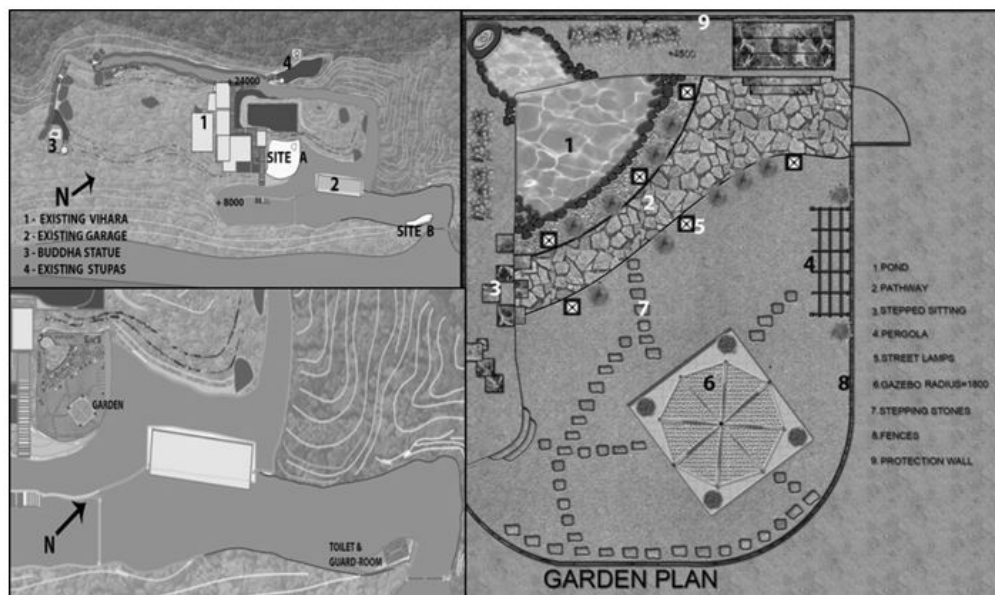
Amingaon Buddha Vihara – the site and proposed garden plan.
